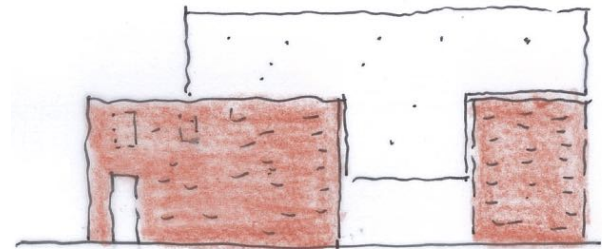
Nimrod Street. Existing brickwork facade and new concrete addition.
